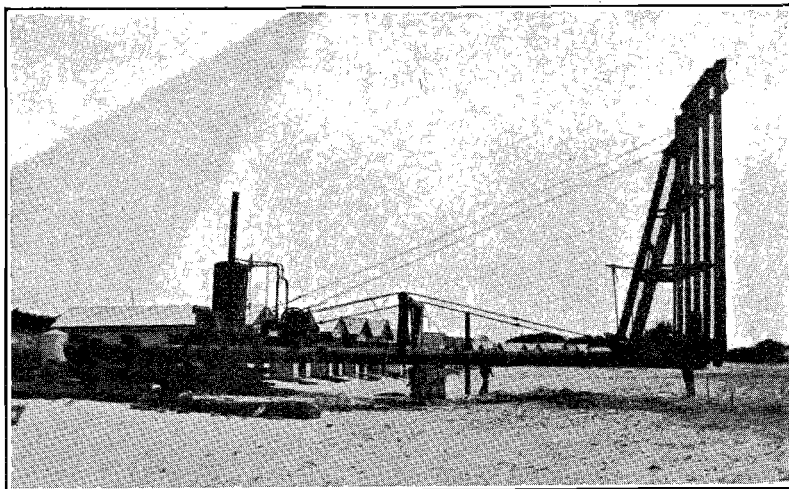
Pile Driving Plant used at Barwon Heads.
